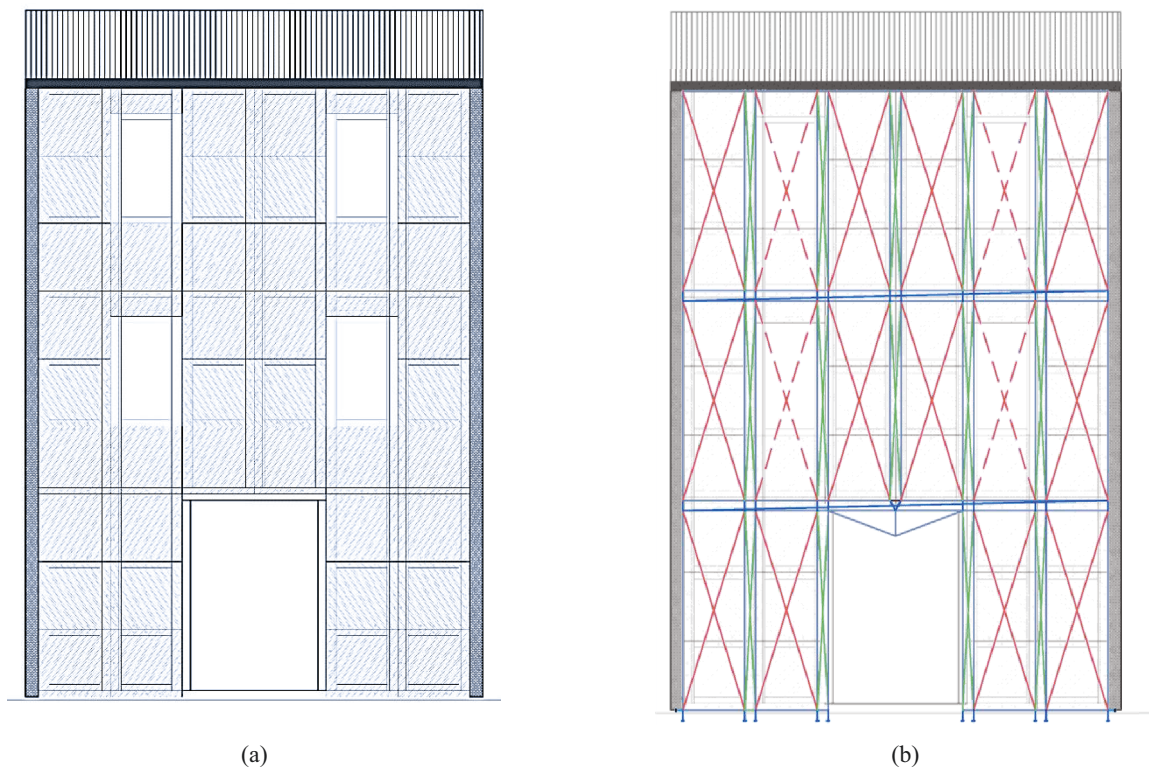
Case-study building. (a) View of the modelled façade; (b) numerical FE model (truss elements) superimposed on the façade: bracing system (in red); vertical joints (in green); base and inter-storey connections (in blue).
